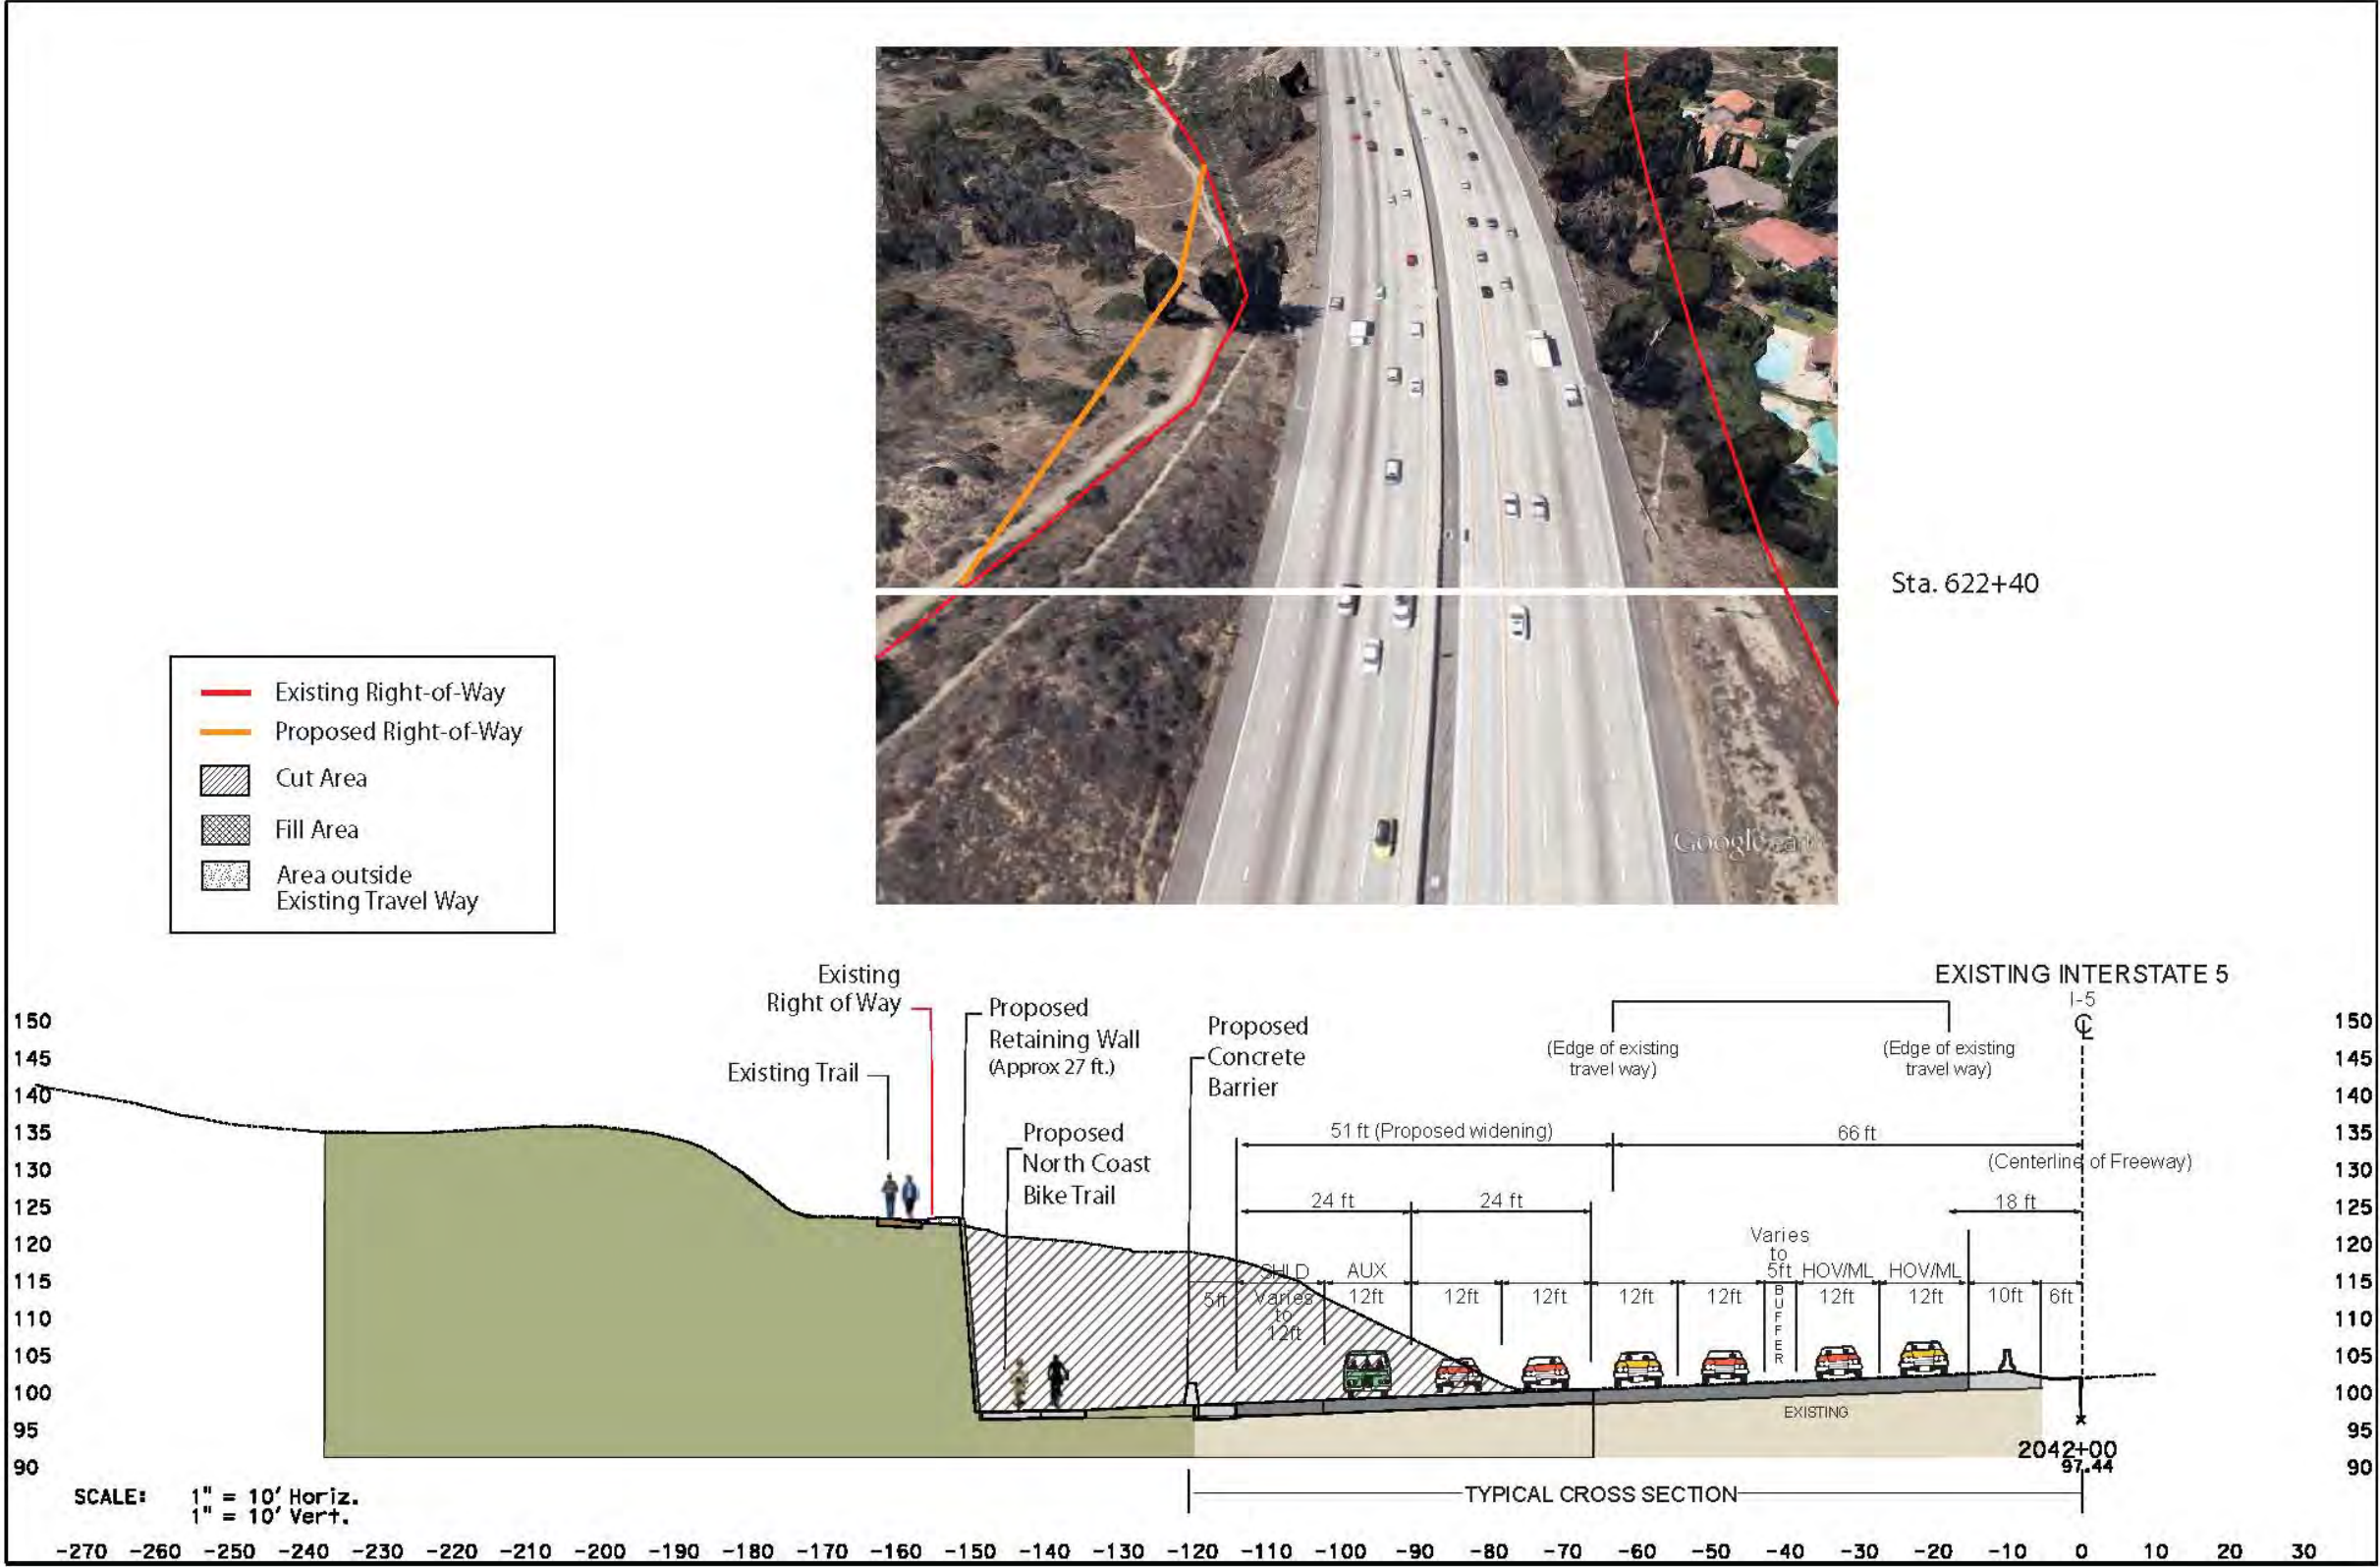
Preferred Alternative Cross Section at Sta. 622 + 40
